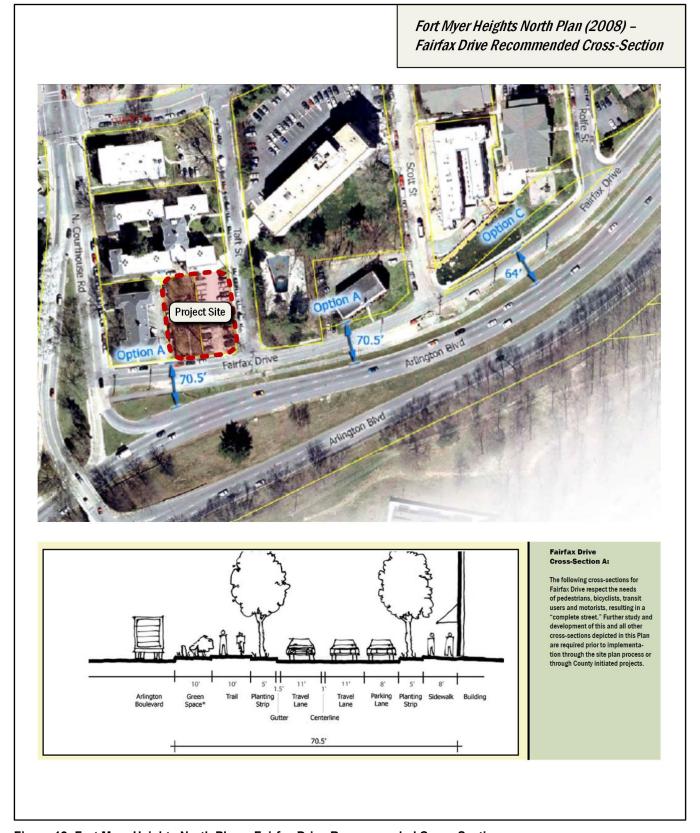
Fort Myer Heights North Plan – Fairfax Drive Recommended Cross-Section
